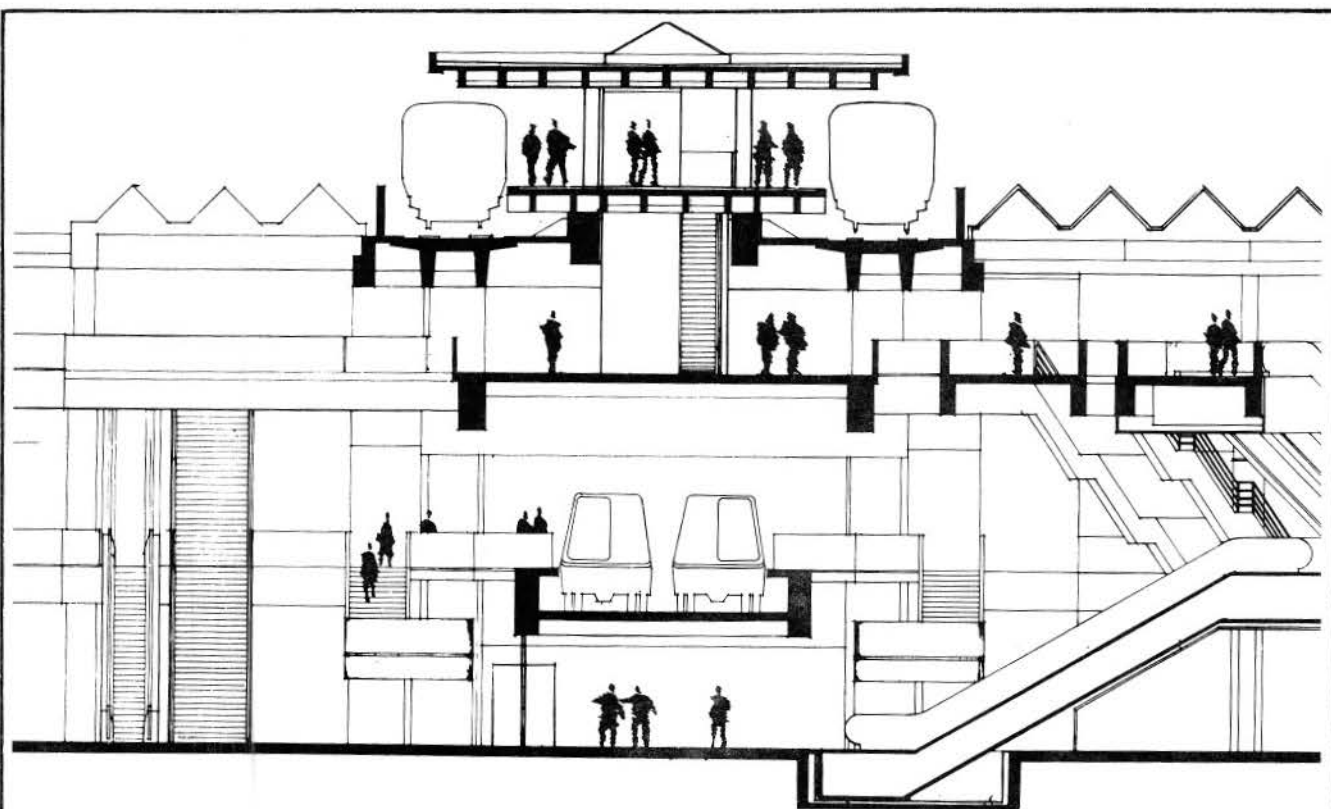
CROSS SECTION AT STATION 'G' LOOKING SOUTH
